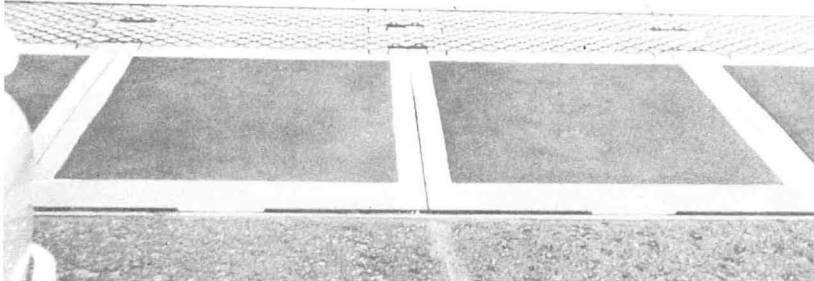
B. Forth Road Bridge - Joints of rolling leaf type take center span movement of 68 inches, side span movement of 17 inches.
